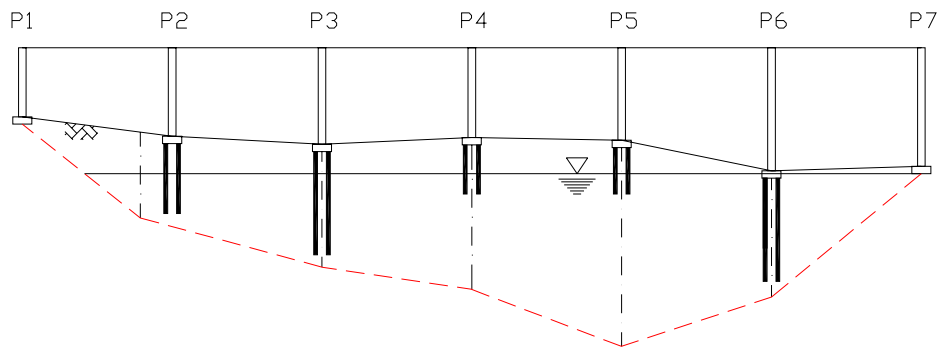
Piers and Pile Groups of Marga-Marga Bridge
